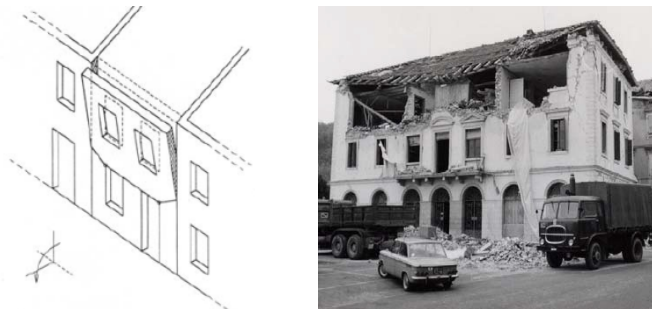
Overturning of the façade wall (Logormasino, 2007).
